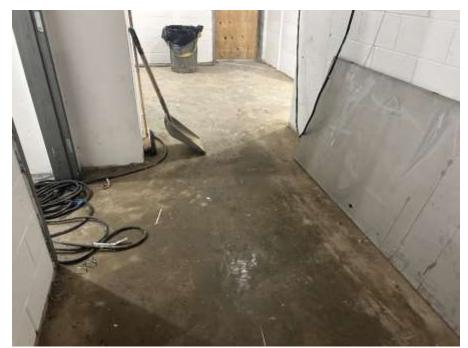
View of the central part of the site on the ground floor, facing north.
